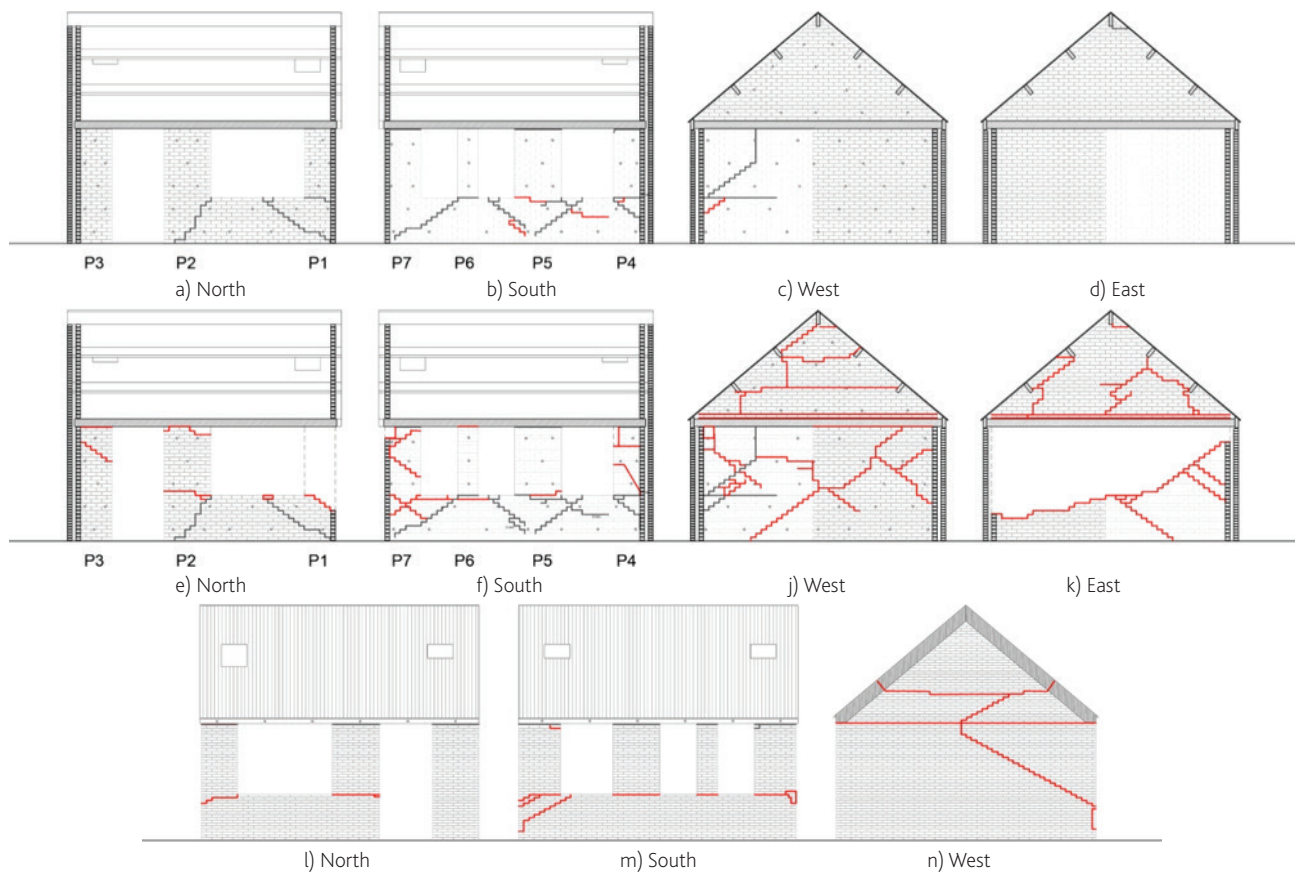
Crack pattern on the CAV-TH-UP specimen after: (a-d) test FEQ2-200%, inner walls; (e-k) test FEQ2-300%, inner walls; (l-n) test FEQ2-300%, veneers. Cracks marked in black were pre-existing. Lightly shaded areas on the inner wall sketches identify plastered areas
